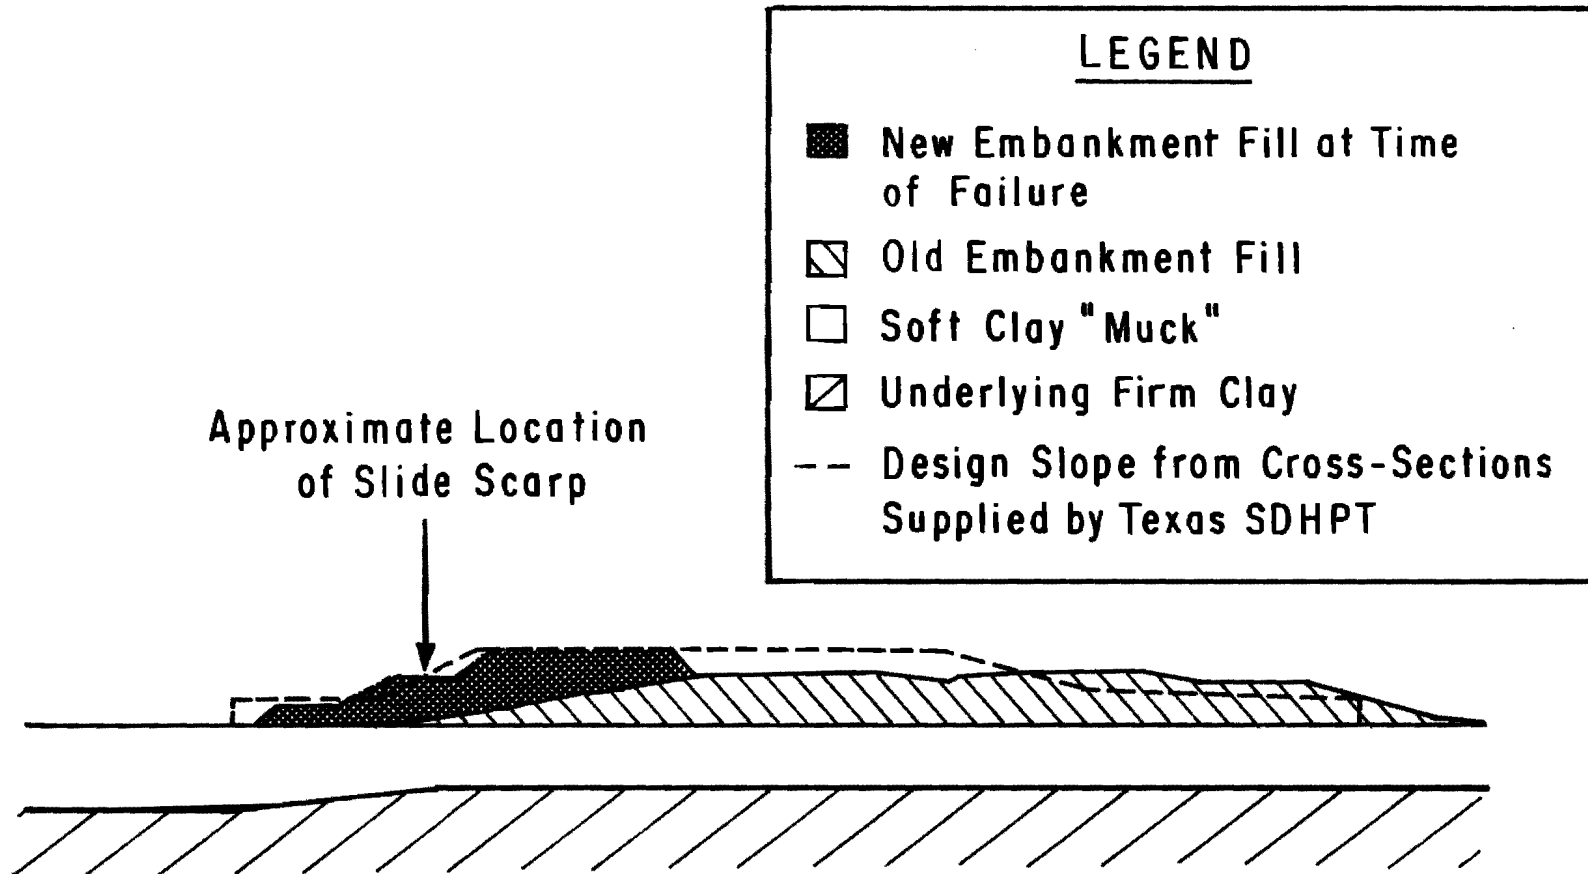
Cross-section of SH 358 embankment near Oso Bay at Station 160 + 00 near the location of the failure.
